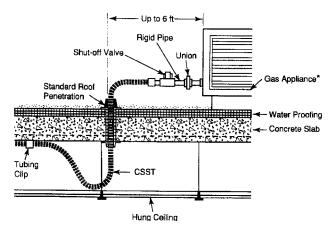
Short (1-6 foot) outdoor connection to roof mounted equipment
